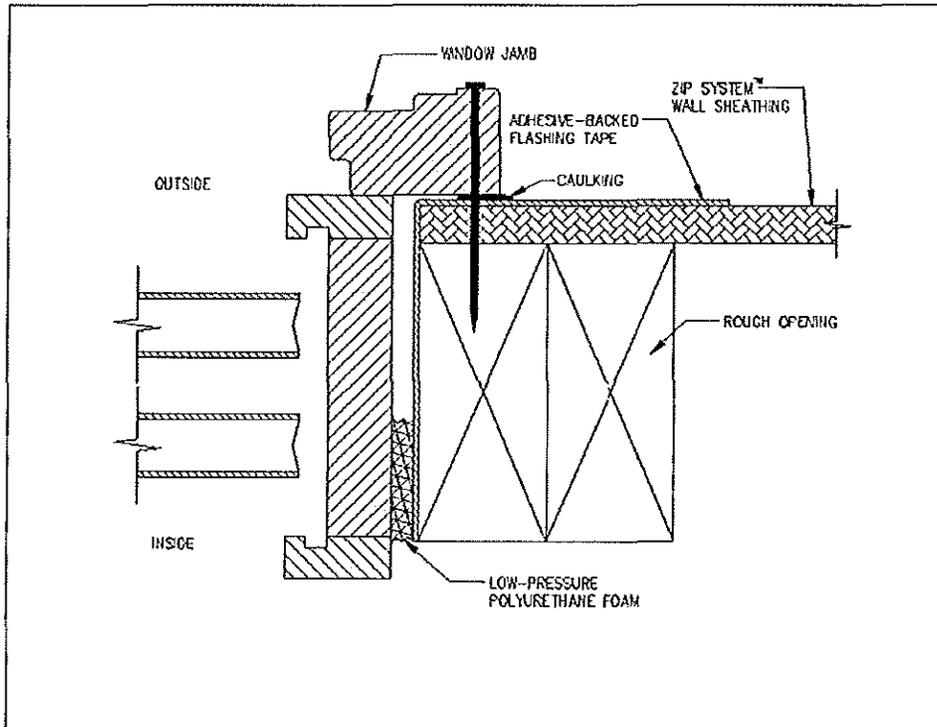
TYPICAL CROSS SECTIONS OF FLANGED WINDOW
